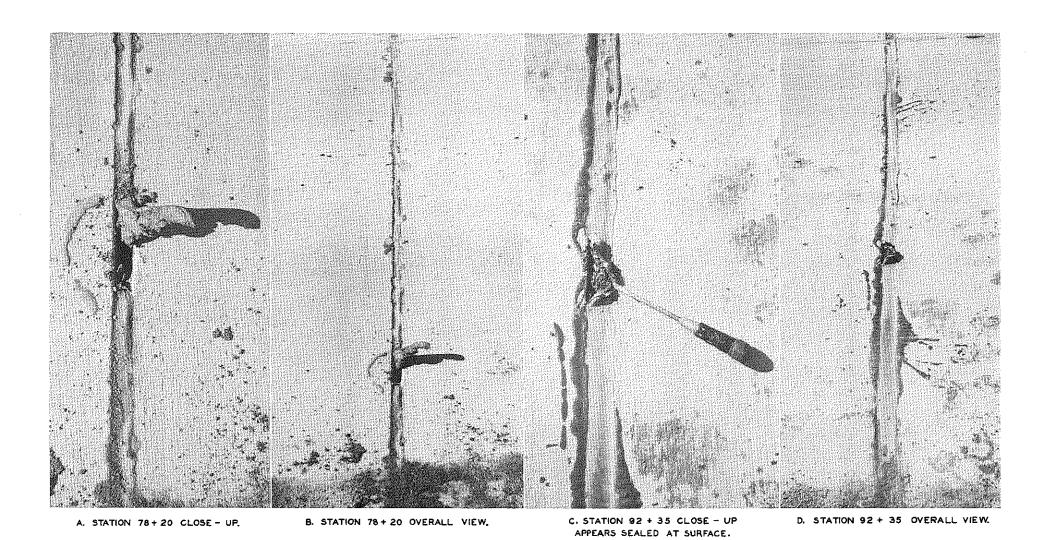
FIGURE I. FORMED CONTRACTION JOINTS IN WHICH JUTE ROVE WAS NOT USED PRIOR TO SEALING WITH HOT-POUR RUBBER-ASPHALT JOINT SEAL. SEALER LACKED ADHESION AND A CONSIDERABLE AMOUNT OF SAND WAS FOUND UNDER JOINT SEAL.
